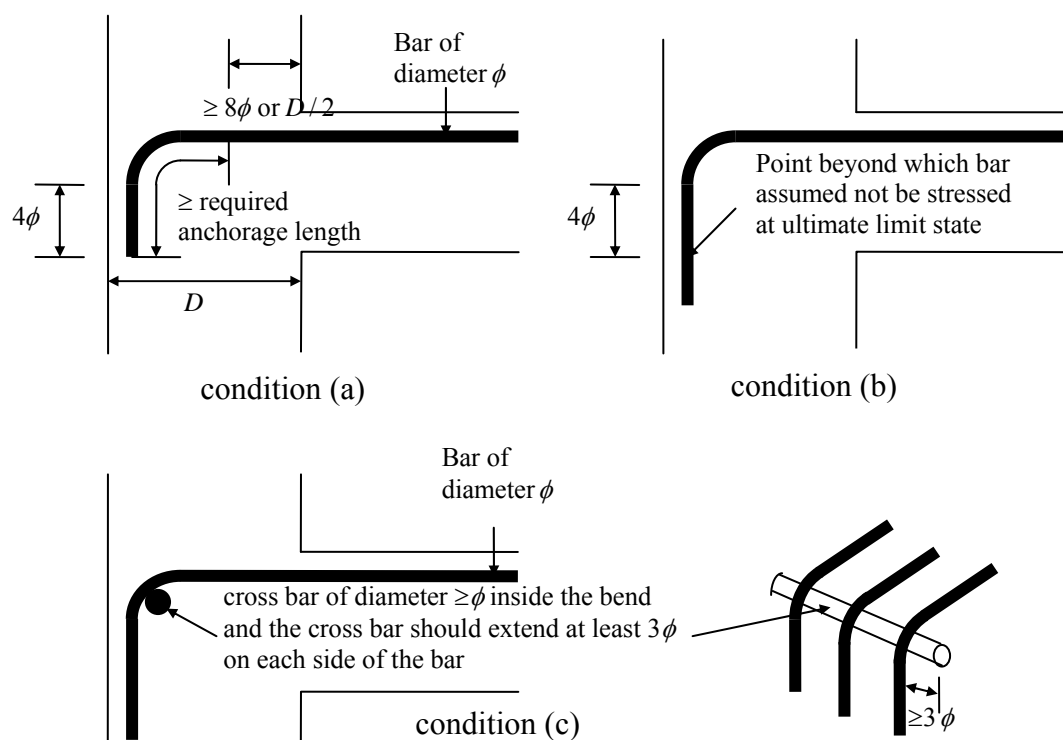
Conditions by which Concrete Failure can be Avoided at Bend of Bars
